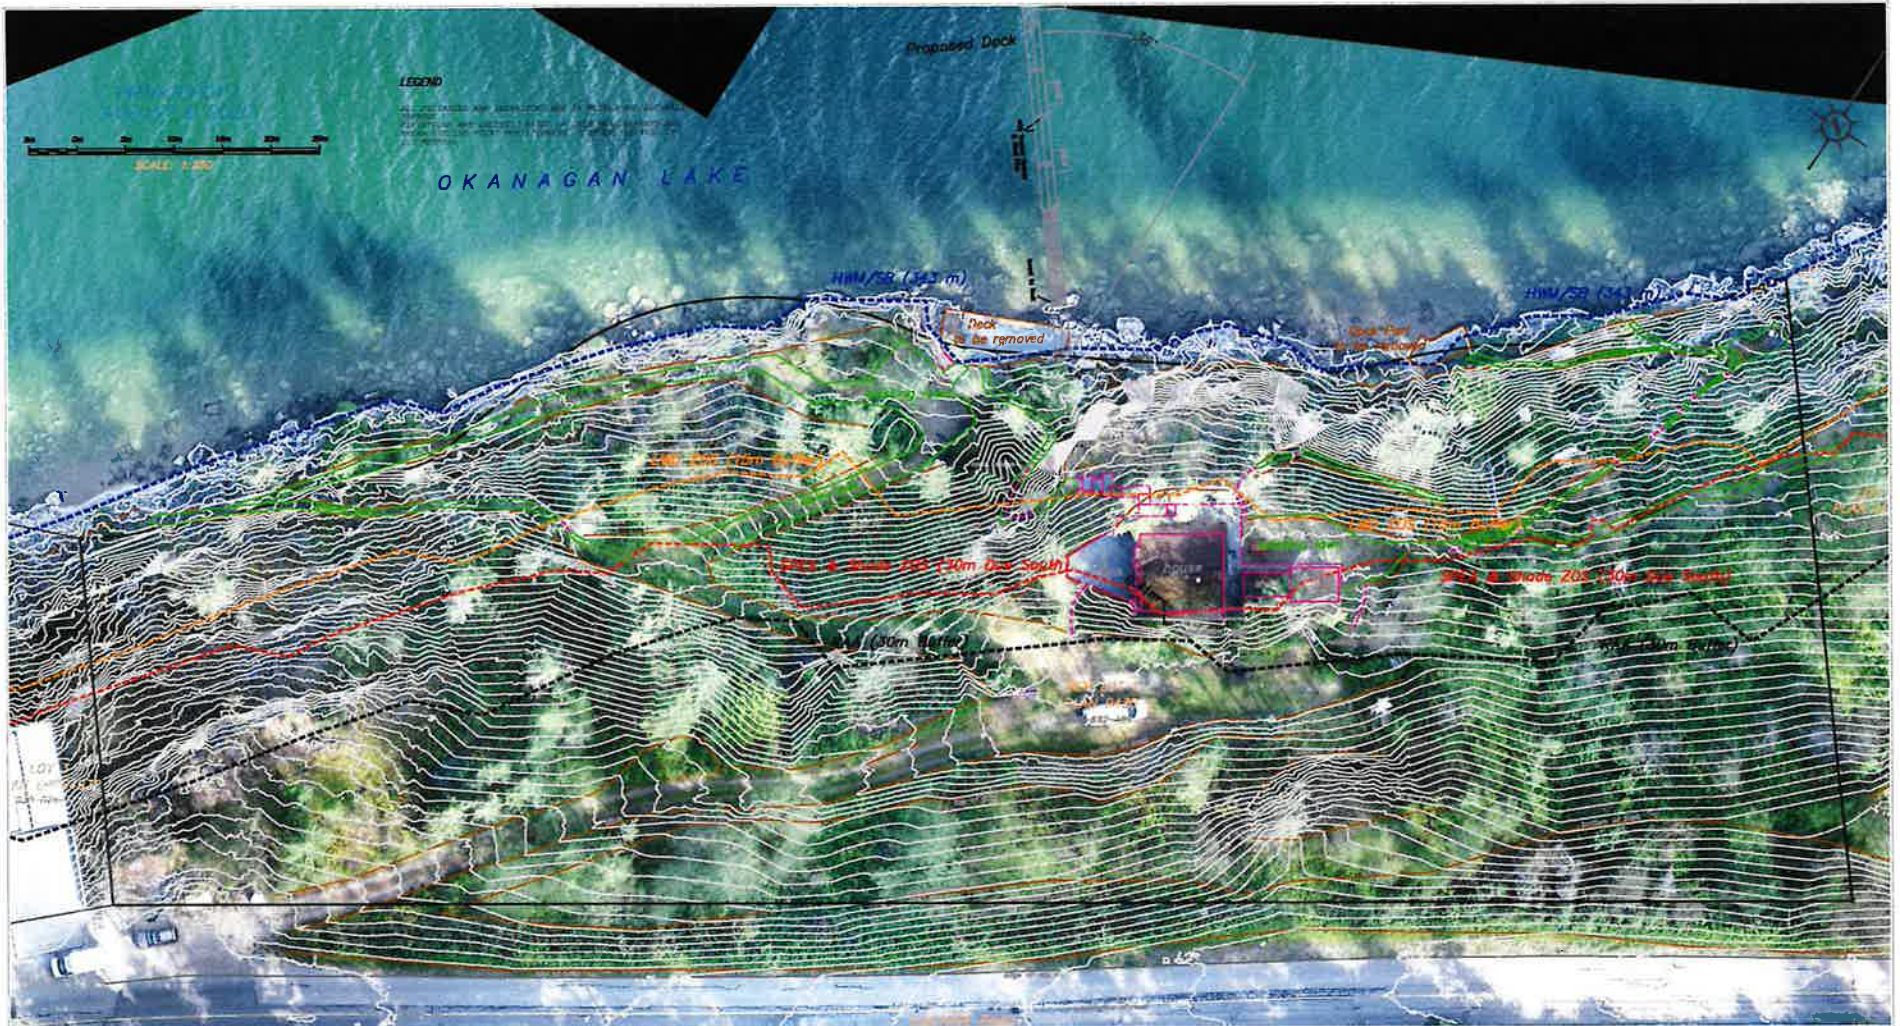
Aerial image (Aug 6, 2020) of site plan with existing structures, trails and RAPR determined SPEA.
